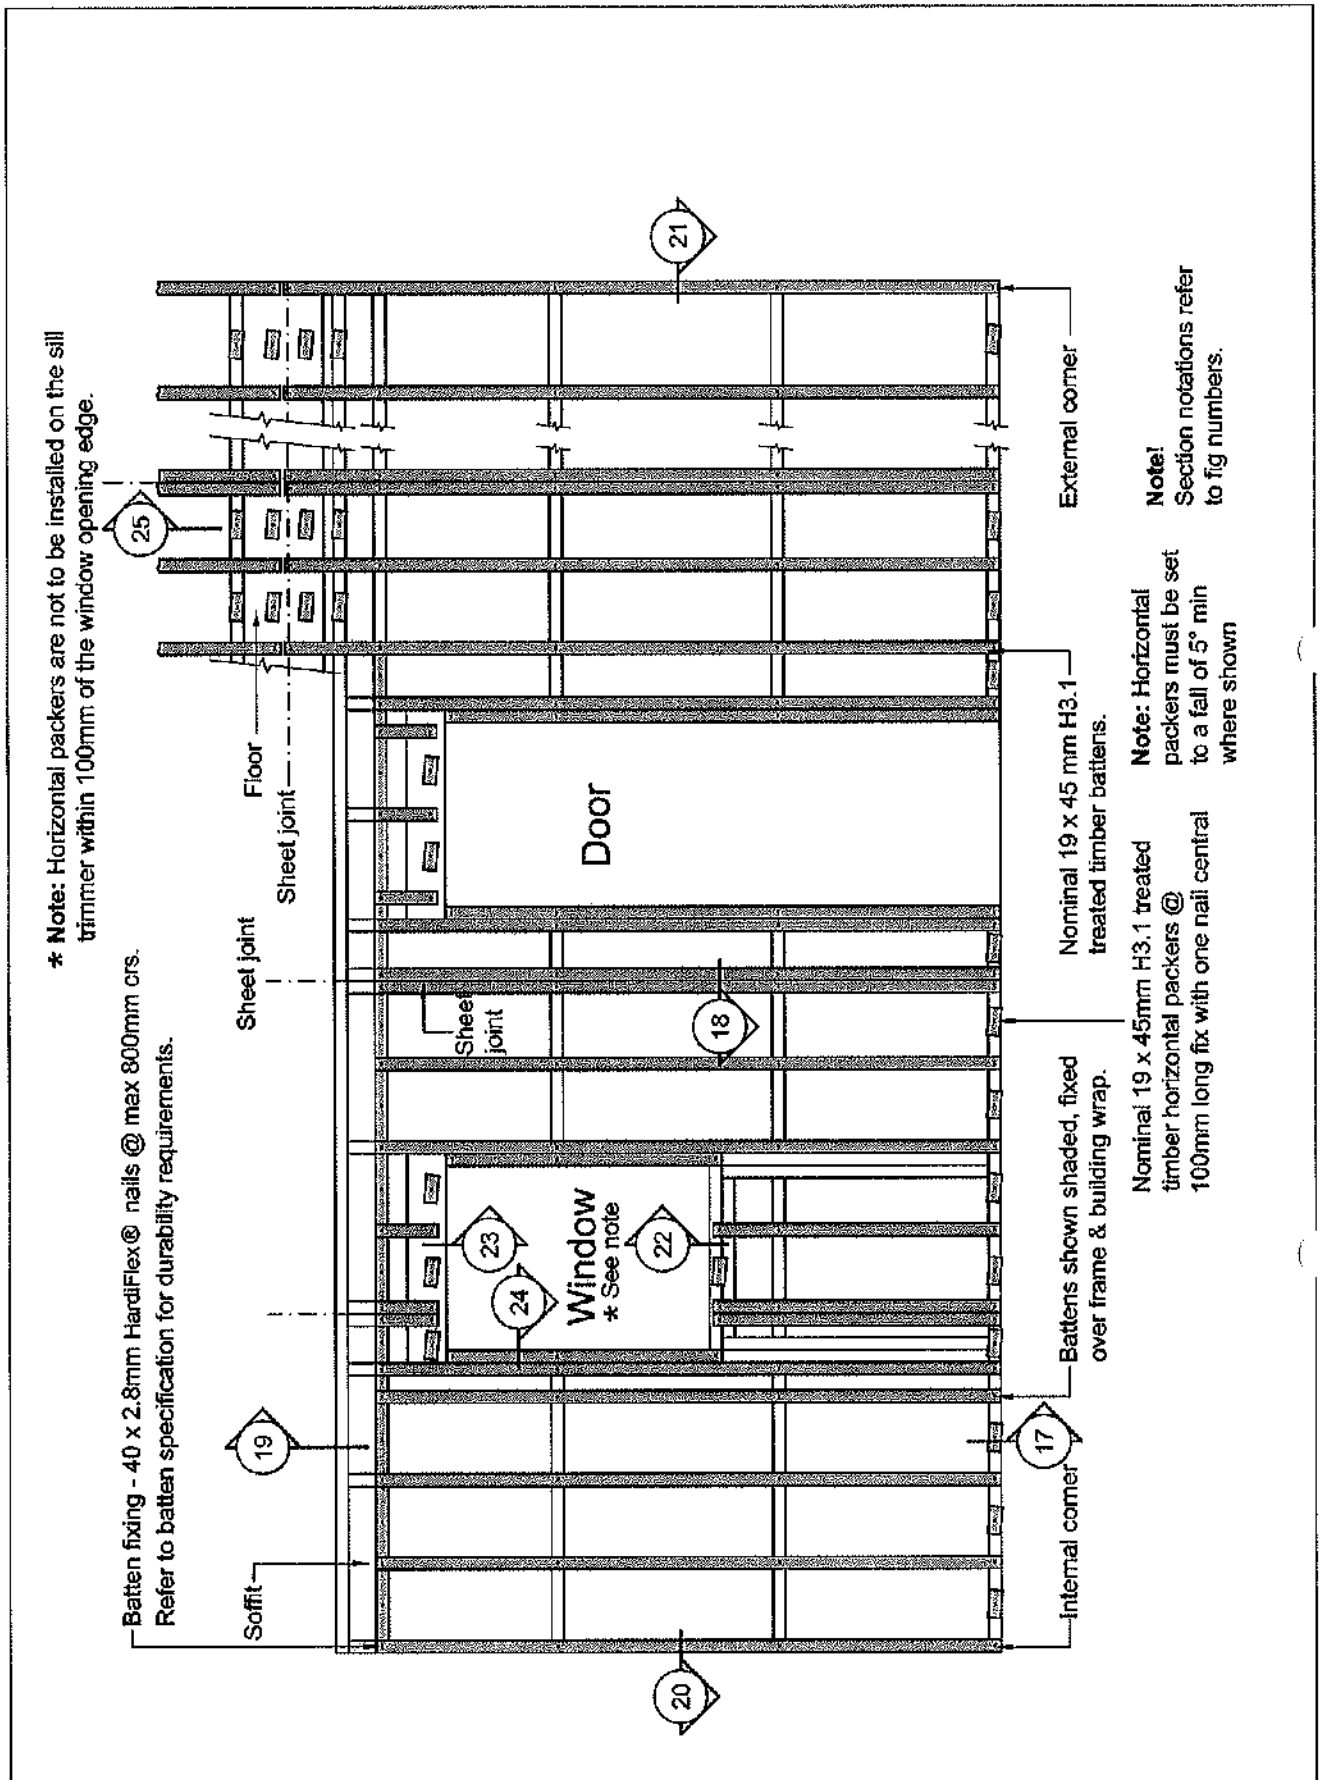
CAVITY FIXED TYPICAL FRAMING SETOUT
